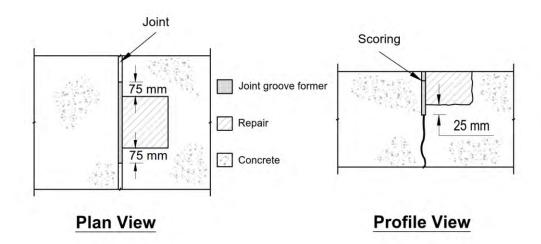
Placement dimensions of joint groove formers in joints for thin bonded repairs and shallow repairs
